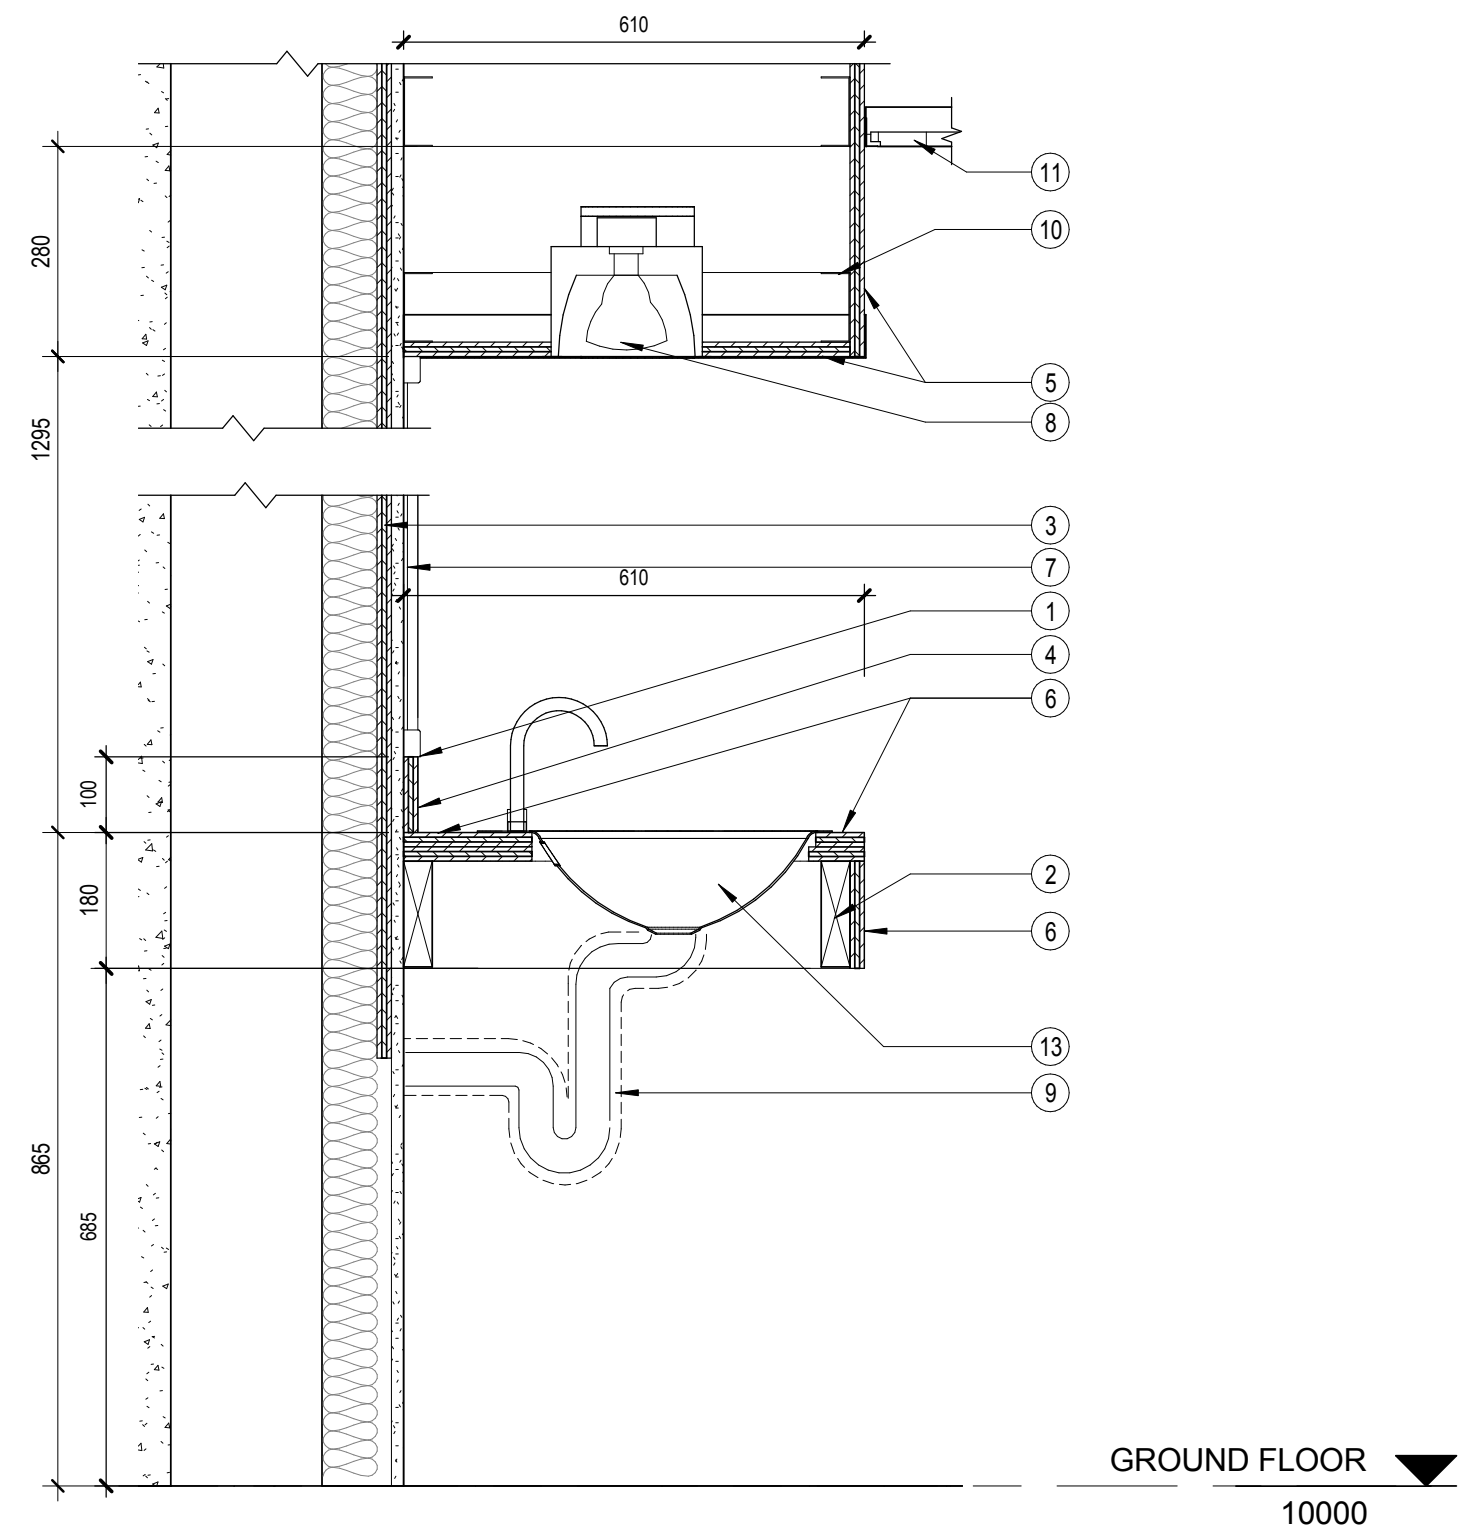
DETAILS - CONSTRUCTION SPECIFICATION STANDARDS
